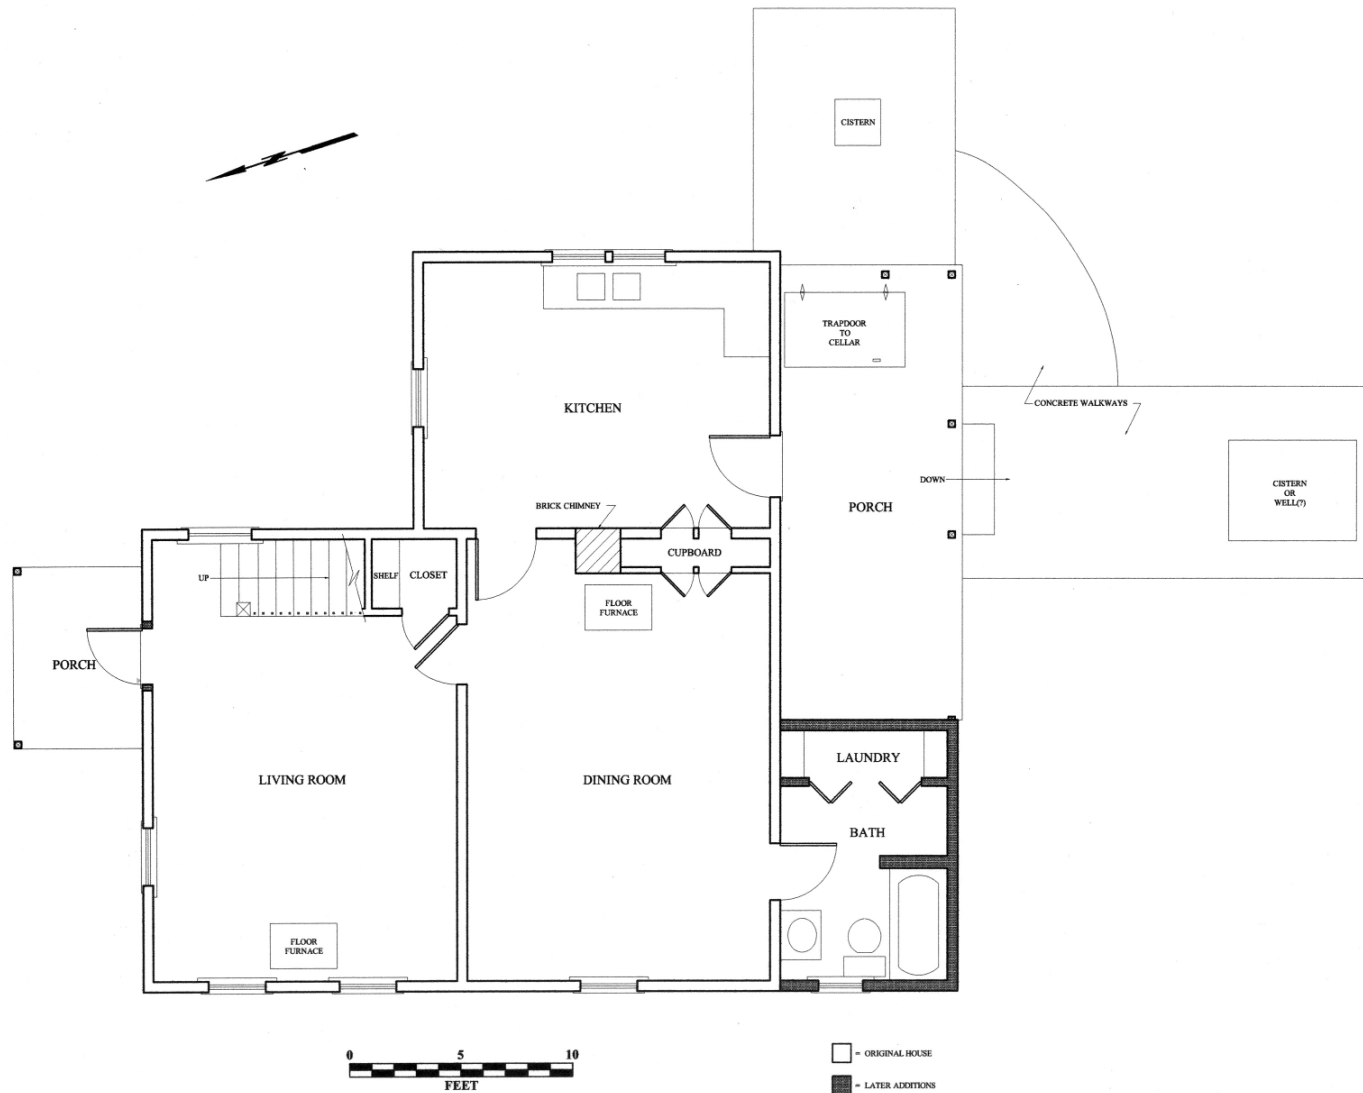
First floor plan of the house at the Belt Farm Site, showing existing conditions.
